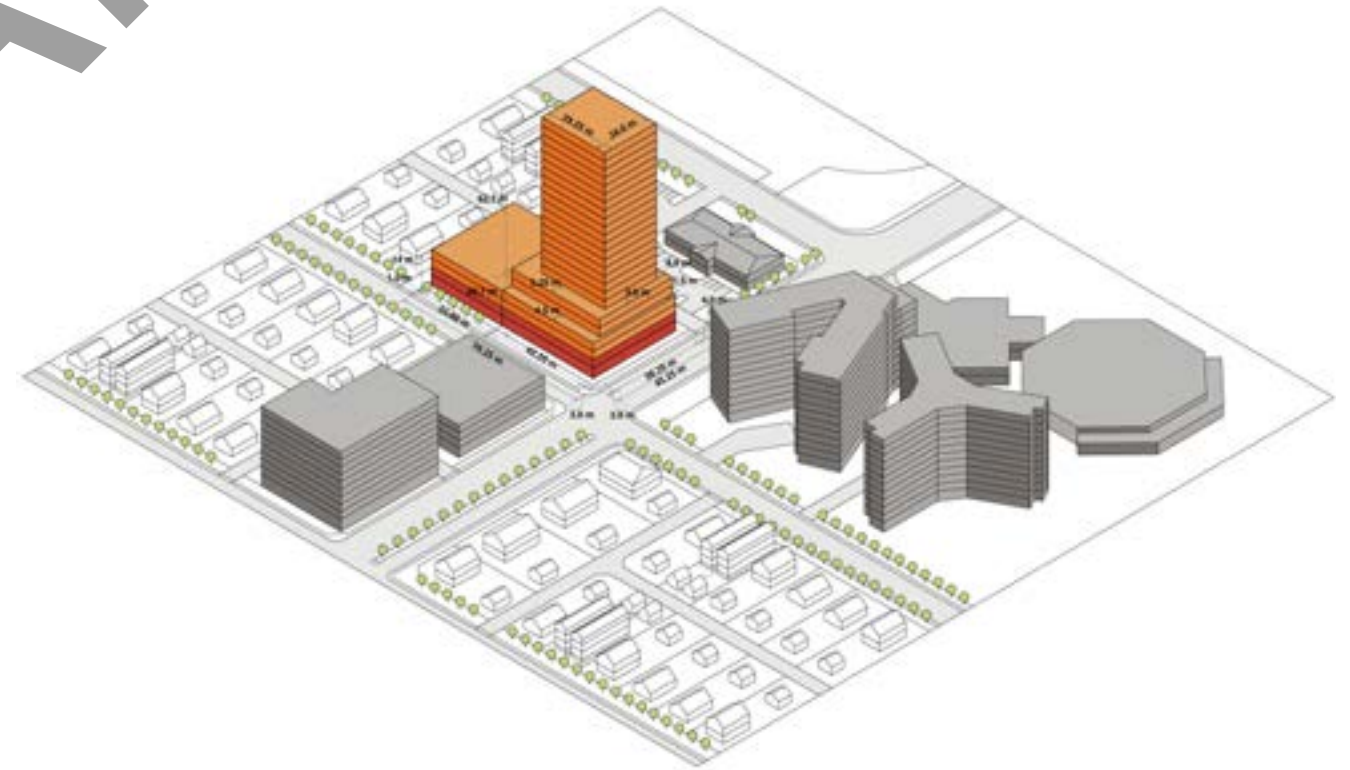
Concept Massing Model – 25 Storey Building (6 Storey Podium)
